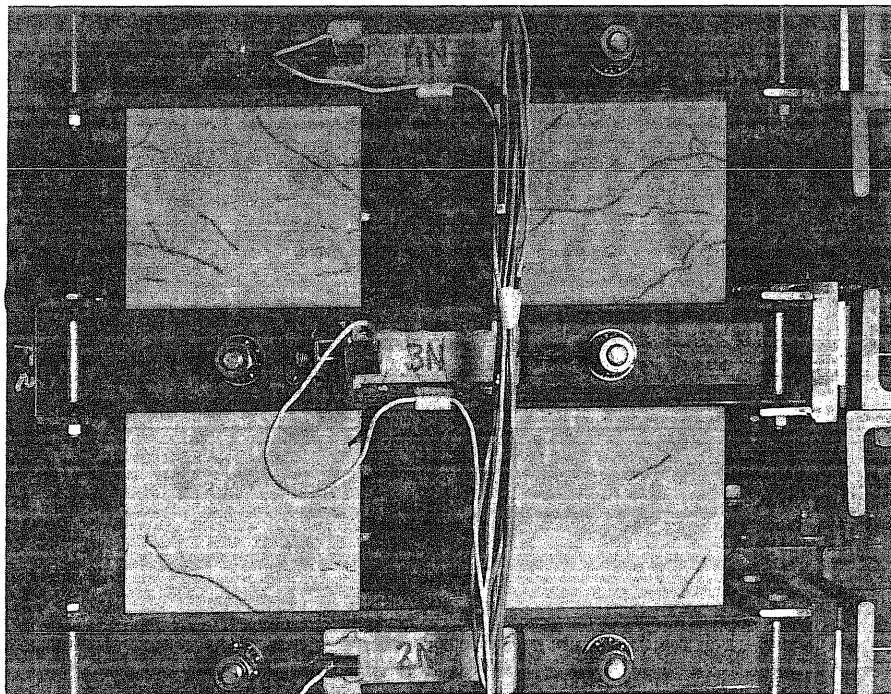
Damage in Lower Piers of Test Structure M
